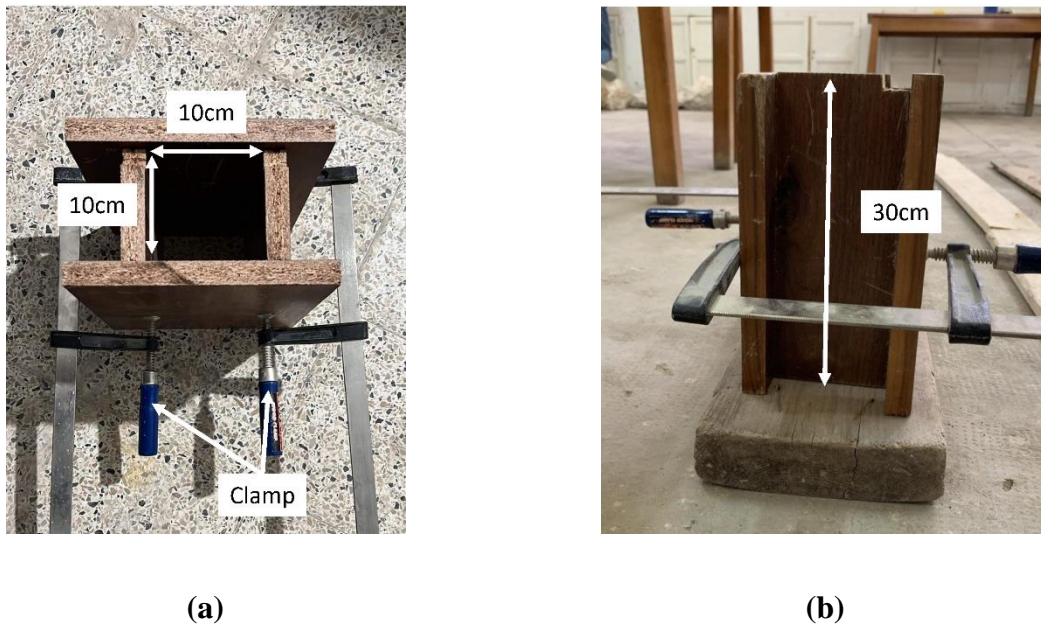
The ma-nufactured wooden mold dimensions (a) and (b)
